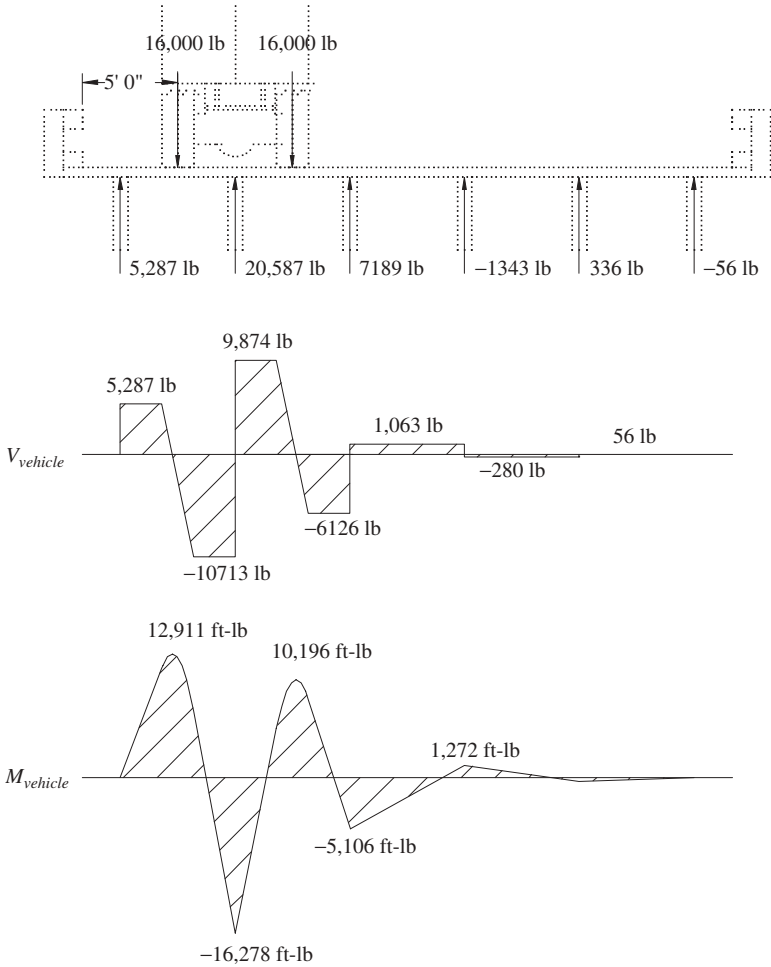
Deck shear and moment with truck placed 5 ft-0 in. from guardrail.
